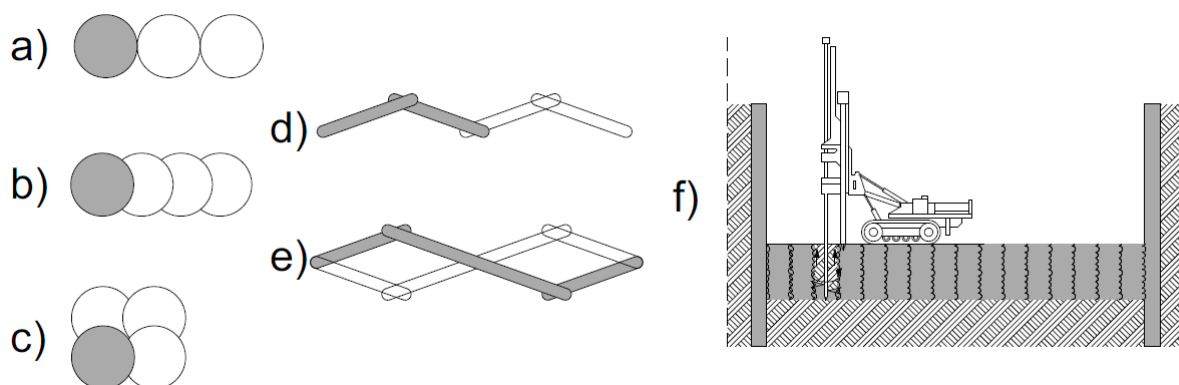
a) reinforcing columns, b) secant columns wall, c) plug, d) single curtain wall, e) double curtain wall, f) bottom plug
